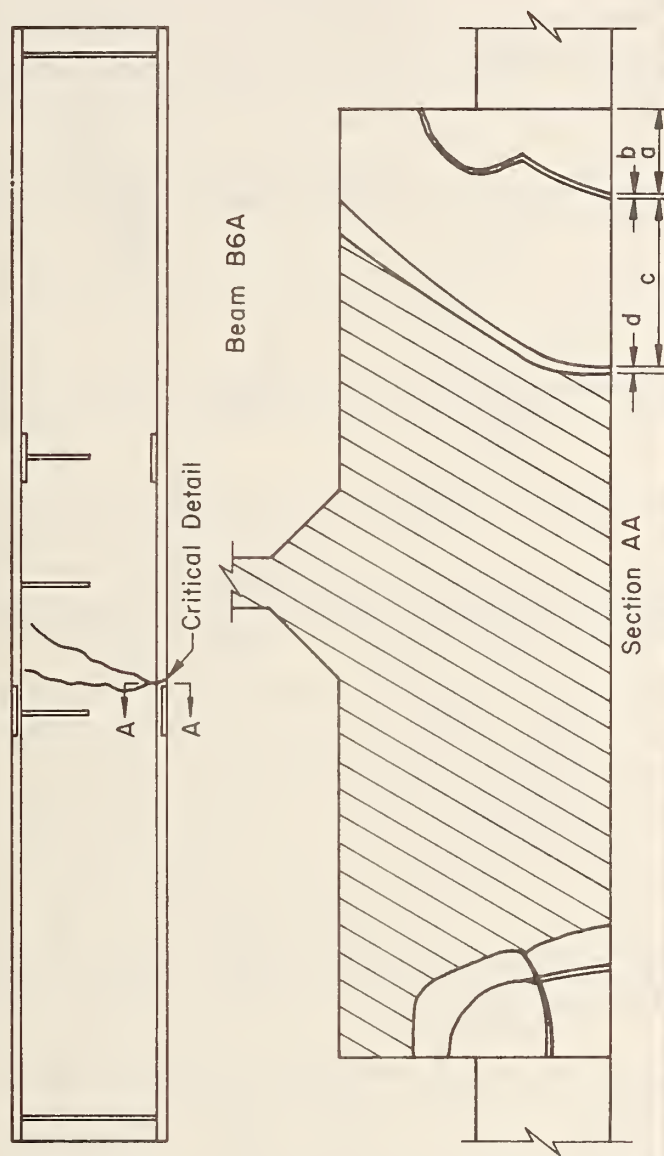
Fatigue and Fracture Surface, B6A (A588)
